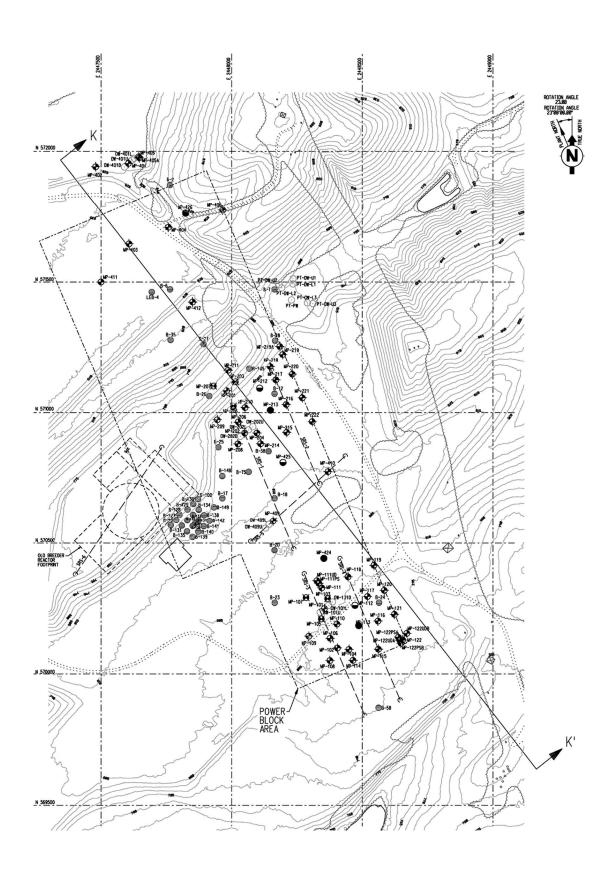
Boring Location Plan at the CRN Site (Reproduced from SSAR Figure 2.5.4-1)
